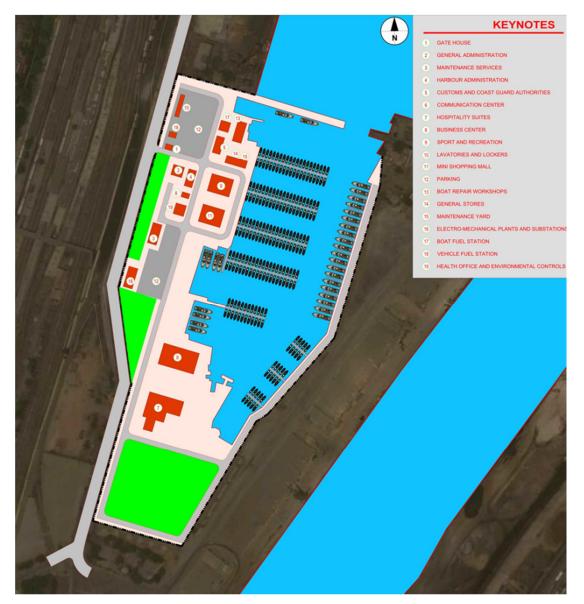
Proposed Layout of Marina at Timber Pond / Boat Basin
